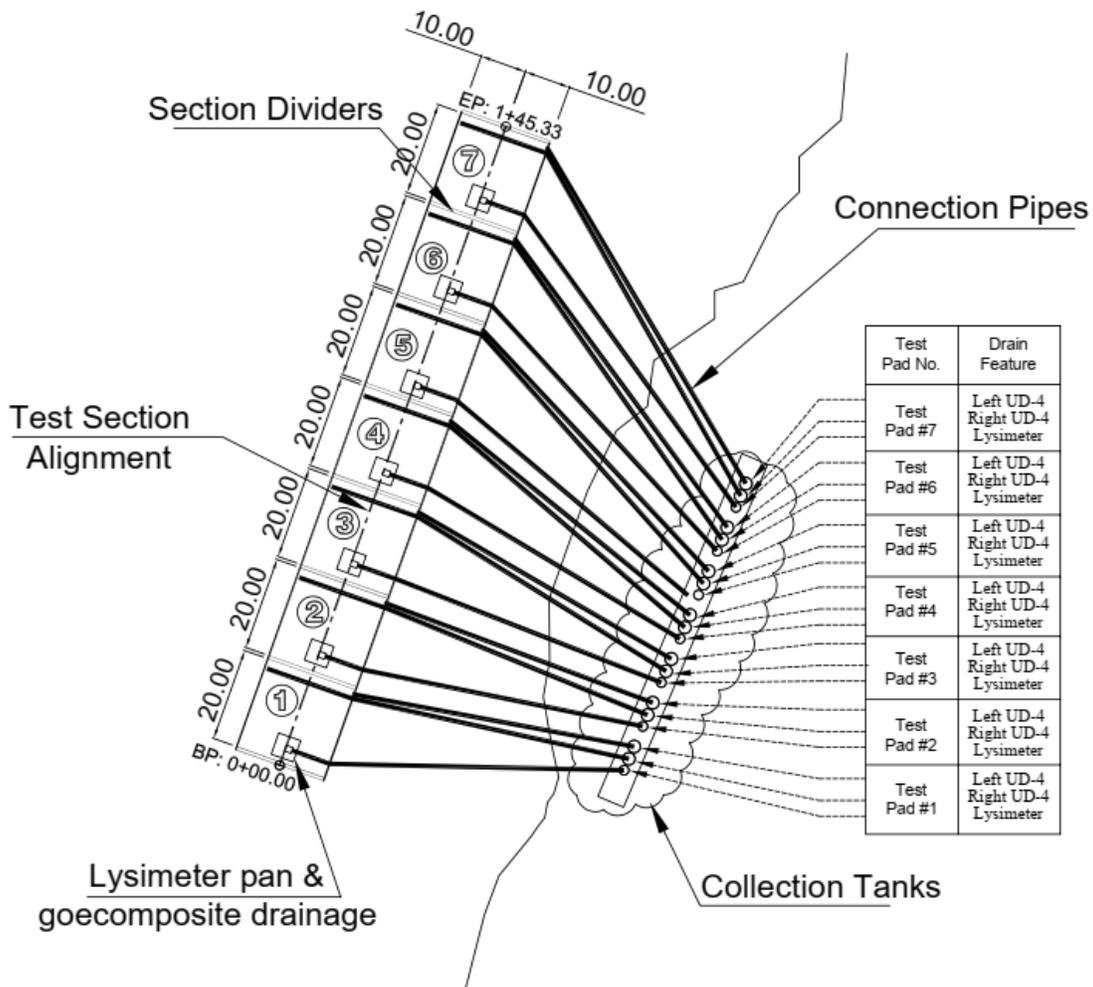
Schematic plan view of the designed test sections (dimensions are in feet)
